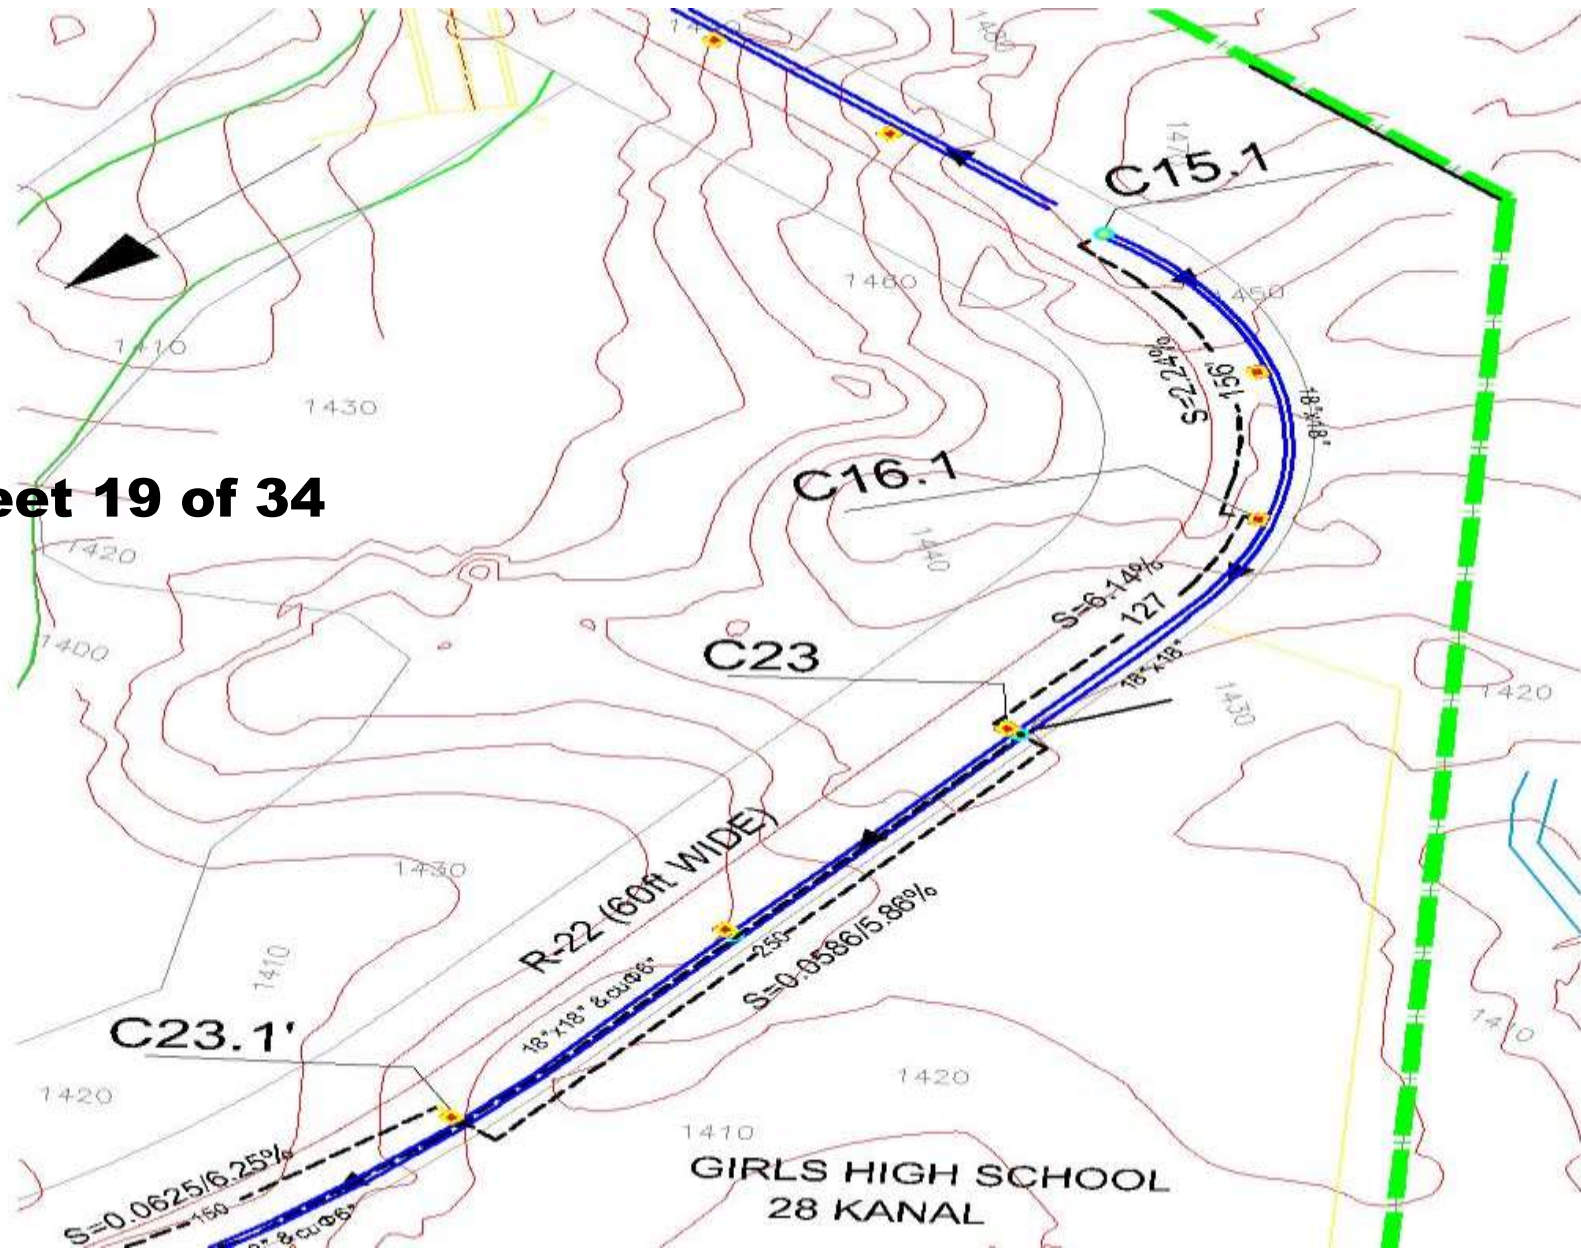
Combined drainage layout plan of Zone-3 at R-22 near girls high school
